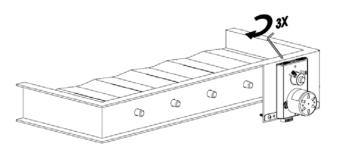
C: Tighten the 3-set screws. The anti-rotation bracket taped at the bottom of the actuator. The bracket can be bent "U" shape if the actuator is away from the mounting surface. Screw down the anti-rotation bracket on to the mounting surface with self tapping screws included (two # 6 or #8 hex self tapping).
